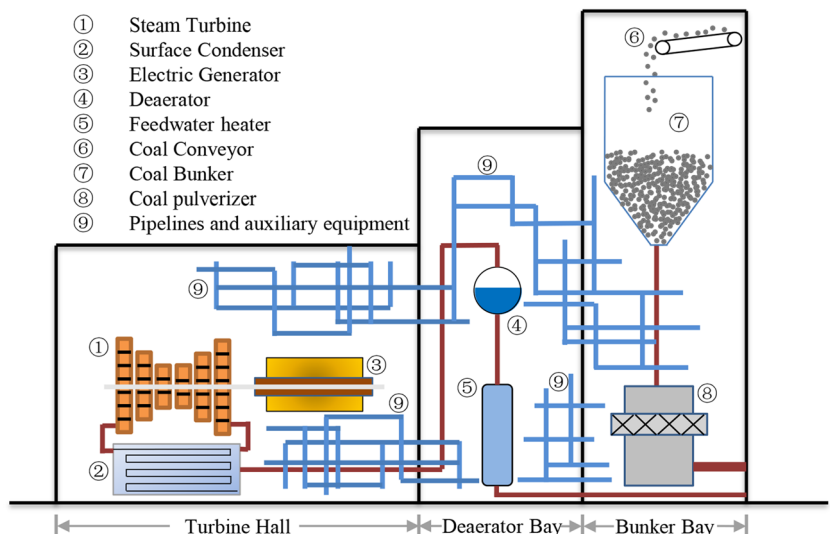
Facility and equipment arrangement in the main industrial building of a typical power plant
